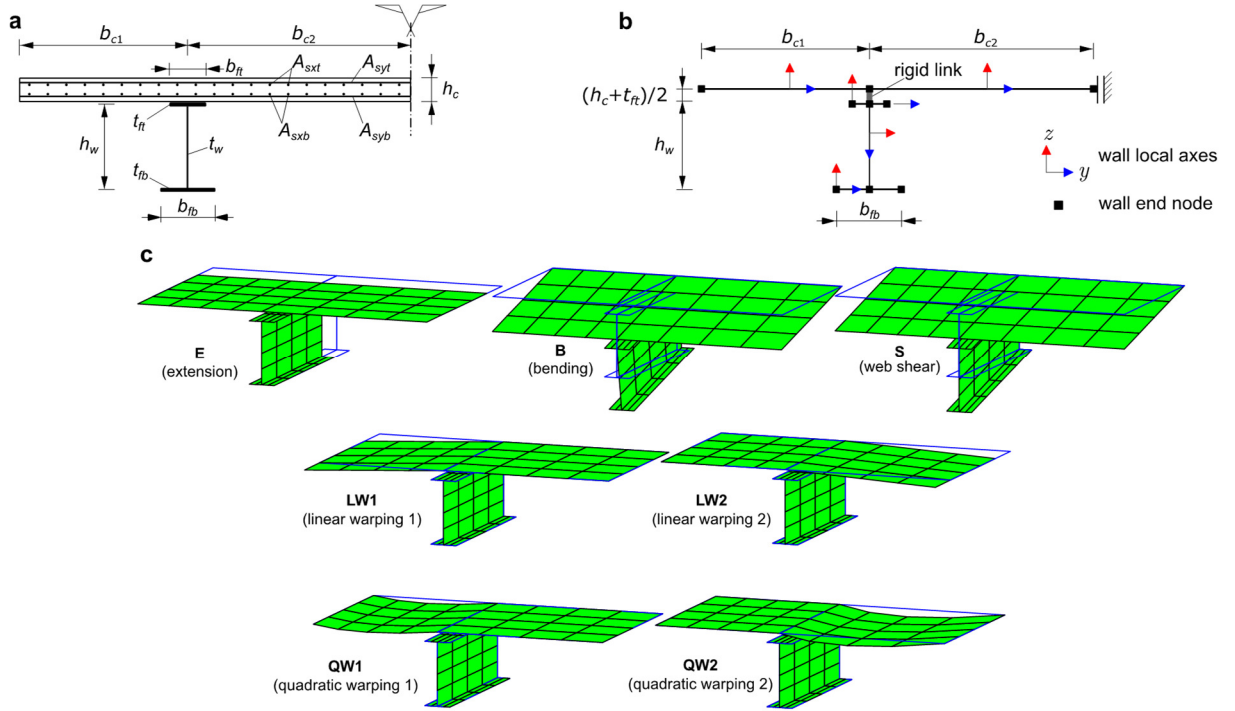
Steel-concrete composite beam (a) cross-section geometry, (b) wall mid-lines and boundary conditions, and (c) cross-section deformation modes.
